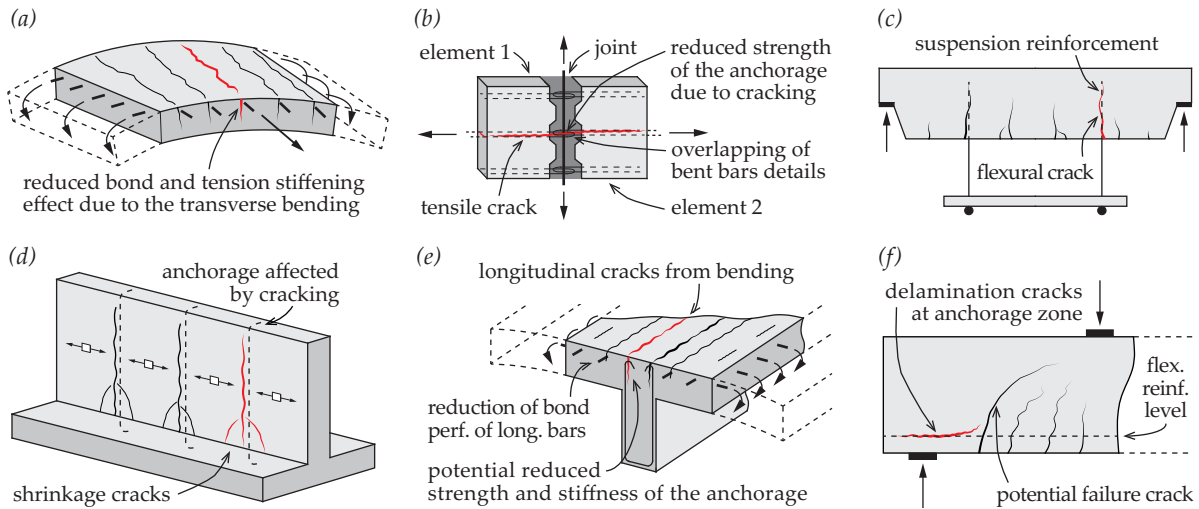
Practical cases in which cracks might develop in the plane of the reinforcement in structural concrete members: (a) flexural reinforcement in slabs [Daw12]; (b) joints of pre-cast elements [Joe15]; (c) suspended loads or fasteners [Lot87]; (d) retaining walls; (e) T-section beam [Reh78a, Reh78b]; and (f) beams without shear reinforcement [Fer15]
